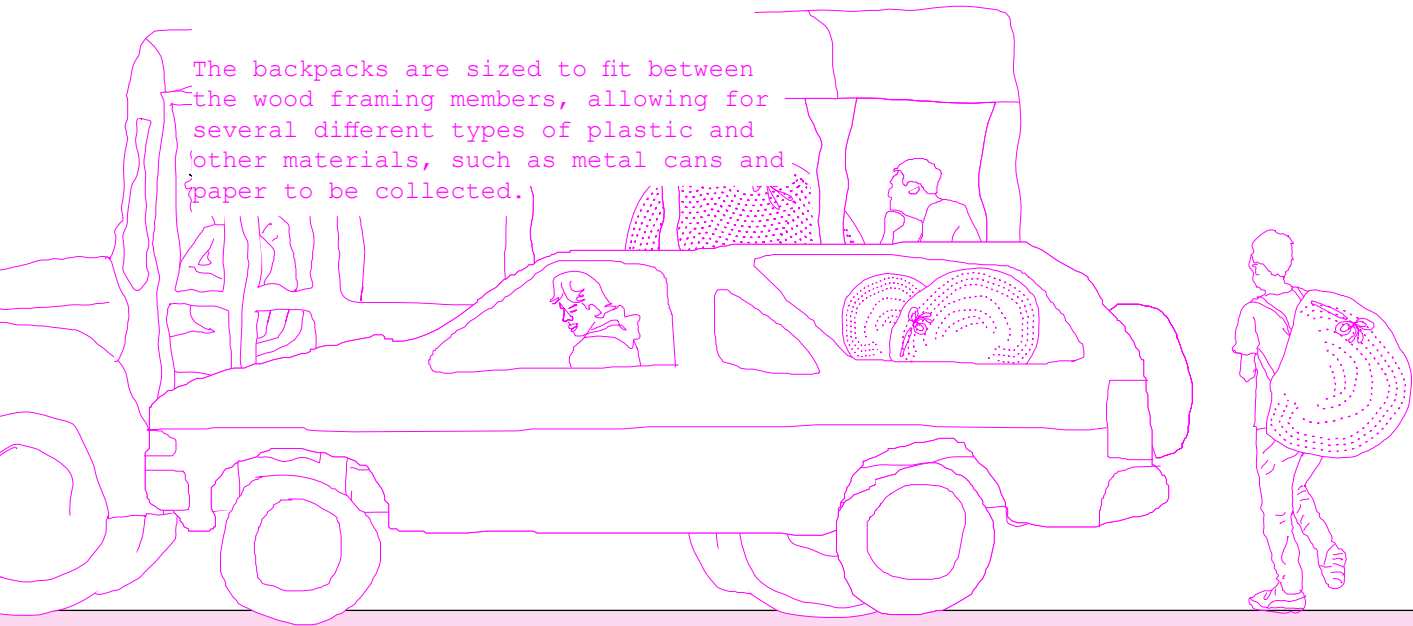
The Fat: Building Section: backpacks of shredded plastic
